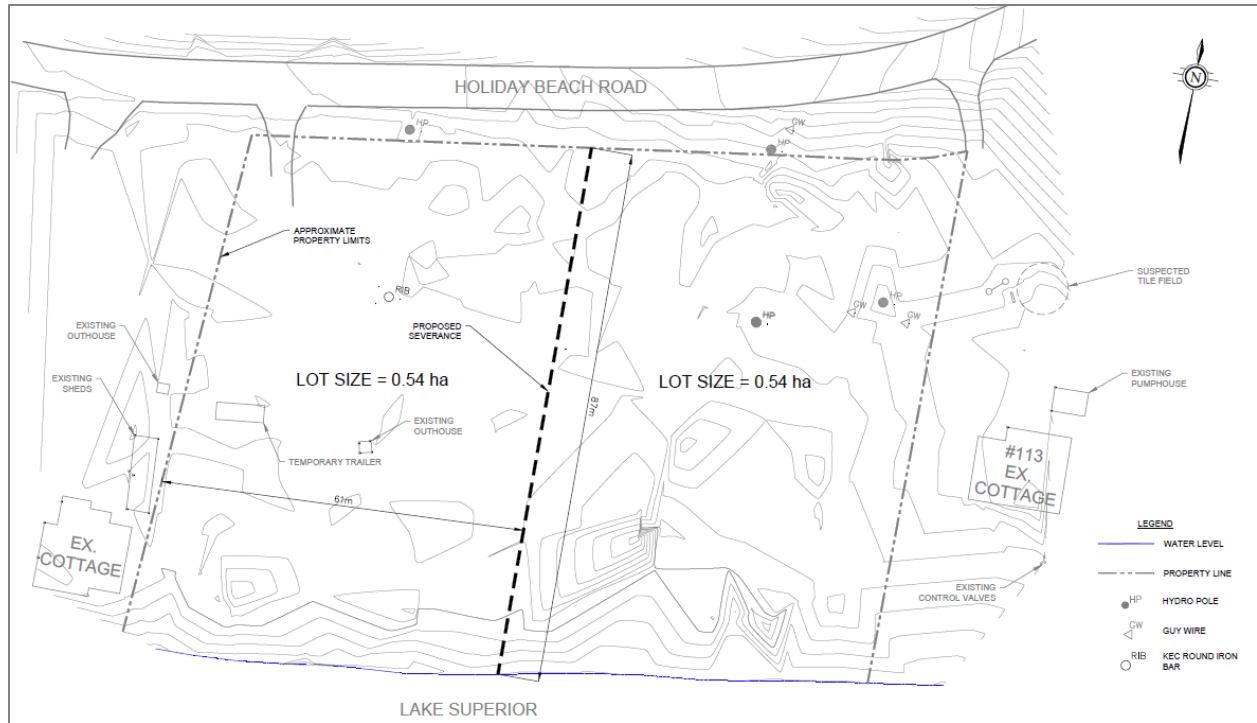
Site Plan supplied by Kresin Engineering showing proposed new lot line (December 2021).
